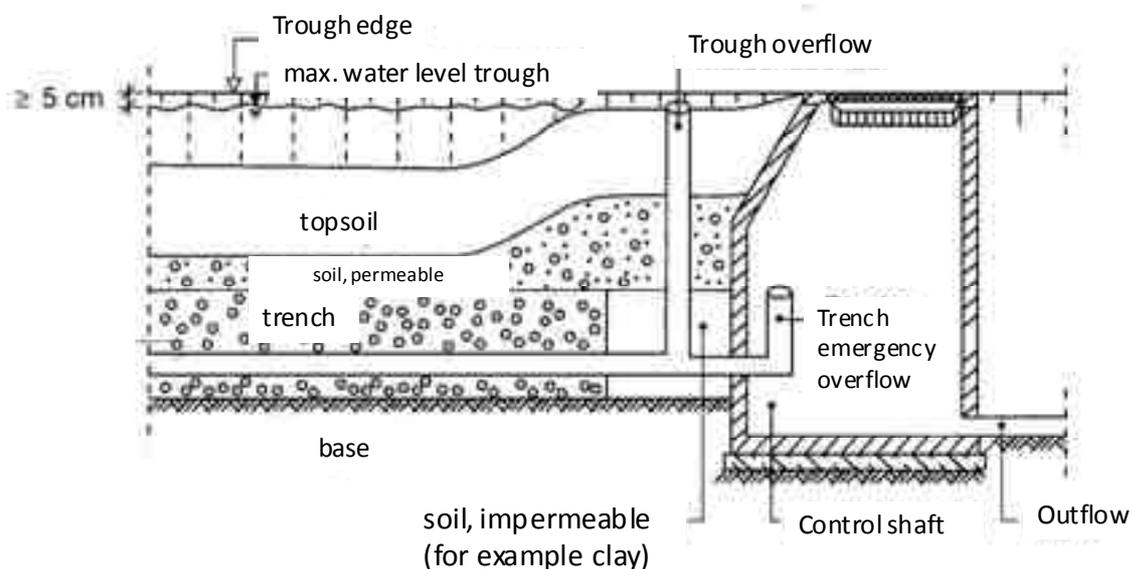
Longitudinal section of a trough-trench-percolation system [FGSV, 2002-b]
